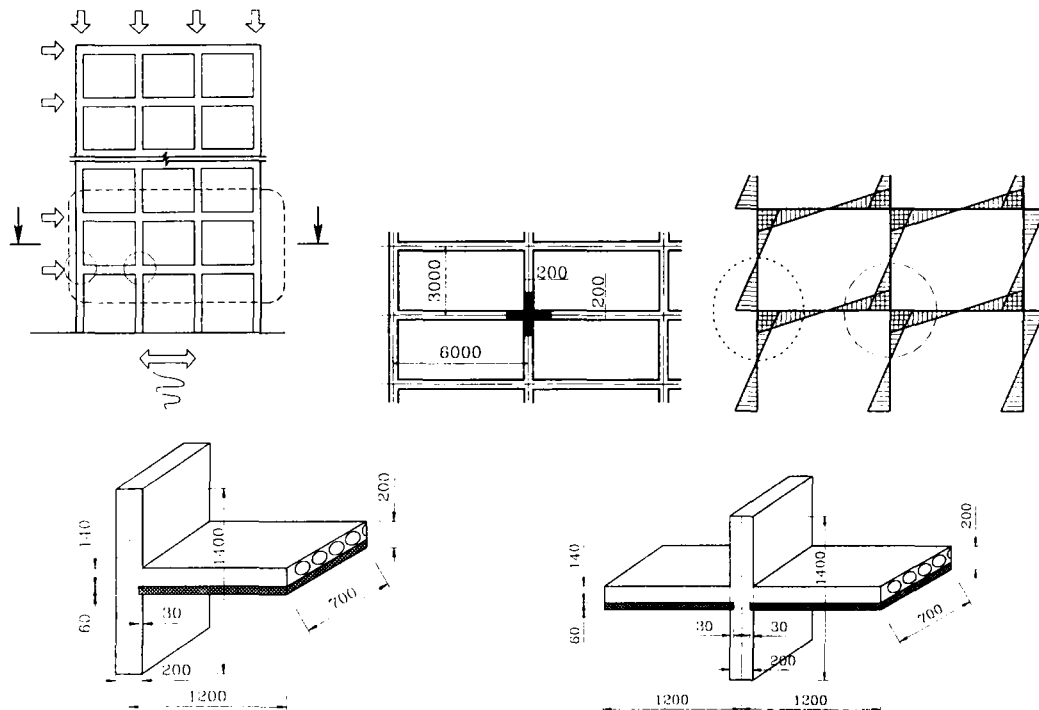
Arrangement of interior and exterior wall-floor connections in multistory building
